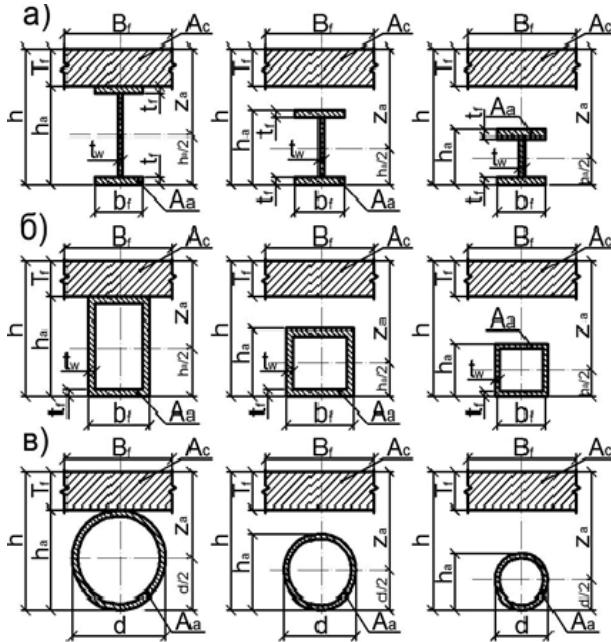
Characteristic ranks of sections of steel concrete beams with top shelf and brought out concrete reinforcement (RCBER)
